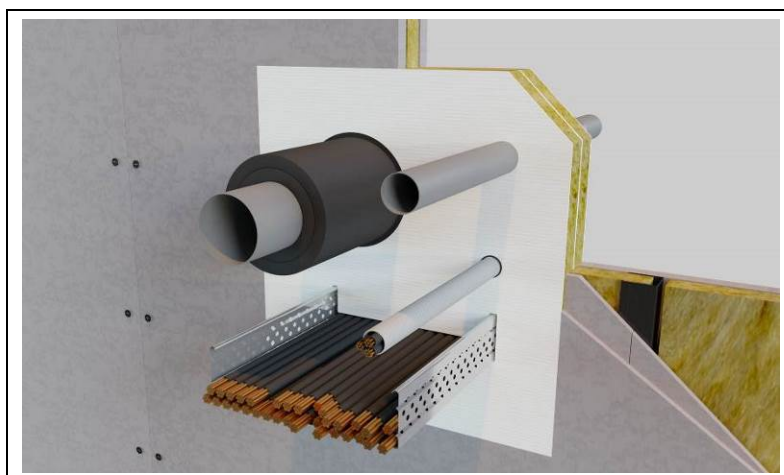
Example of AF PANEL seal in a flexible wall EI 60.
